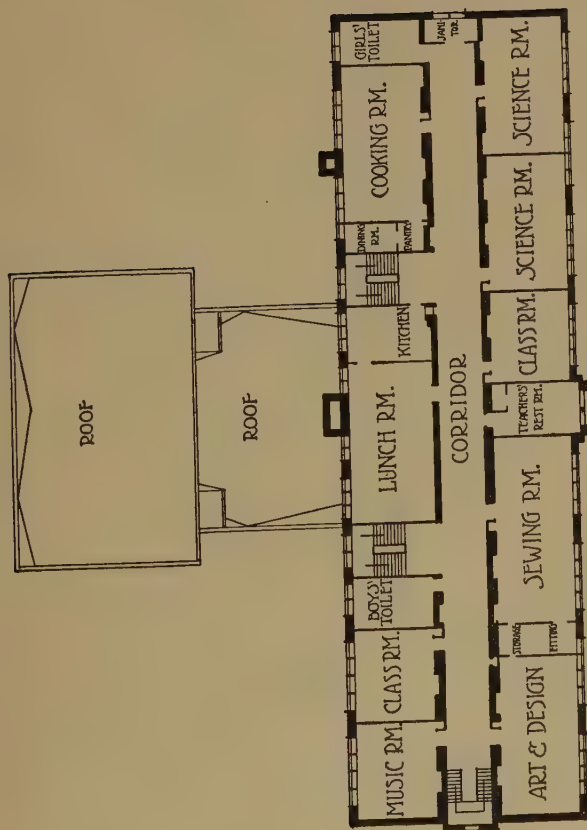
Second-floor plan of the junior high school, Pontiac, Michigan
